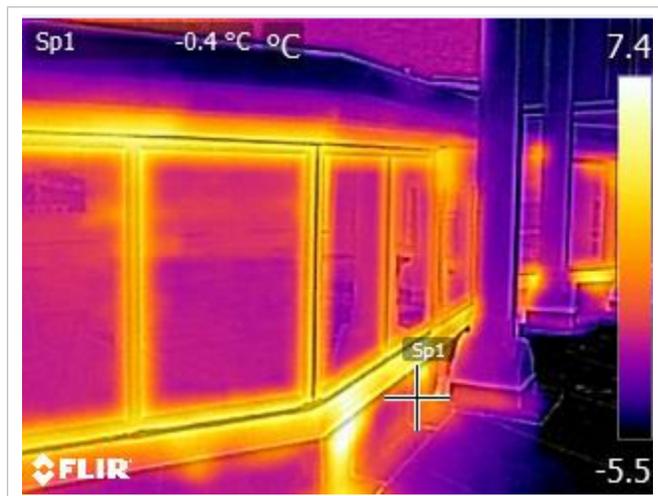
Thermal Image of existing windows indicating thermal bridging
